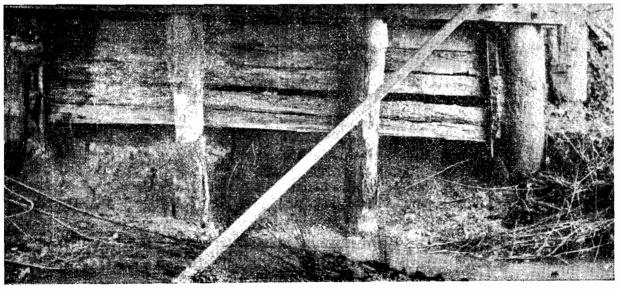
An old timber bridge over Gumbower Creek on the Turrumberry-Lock Road.
